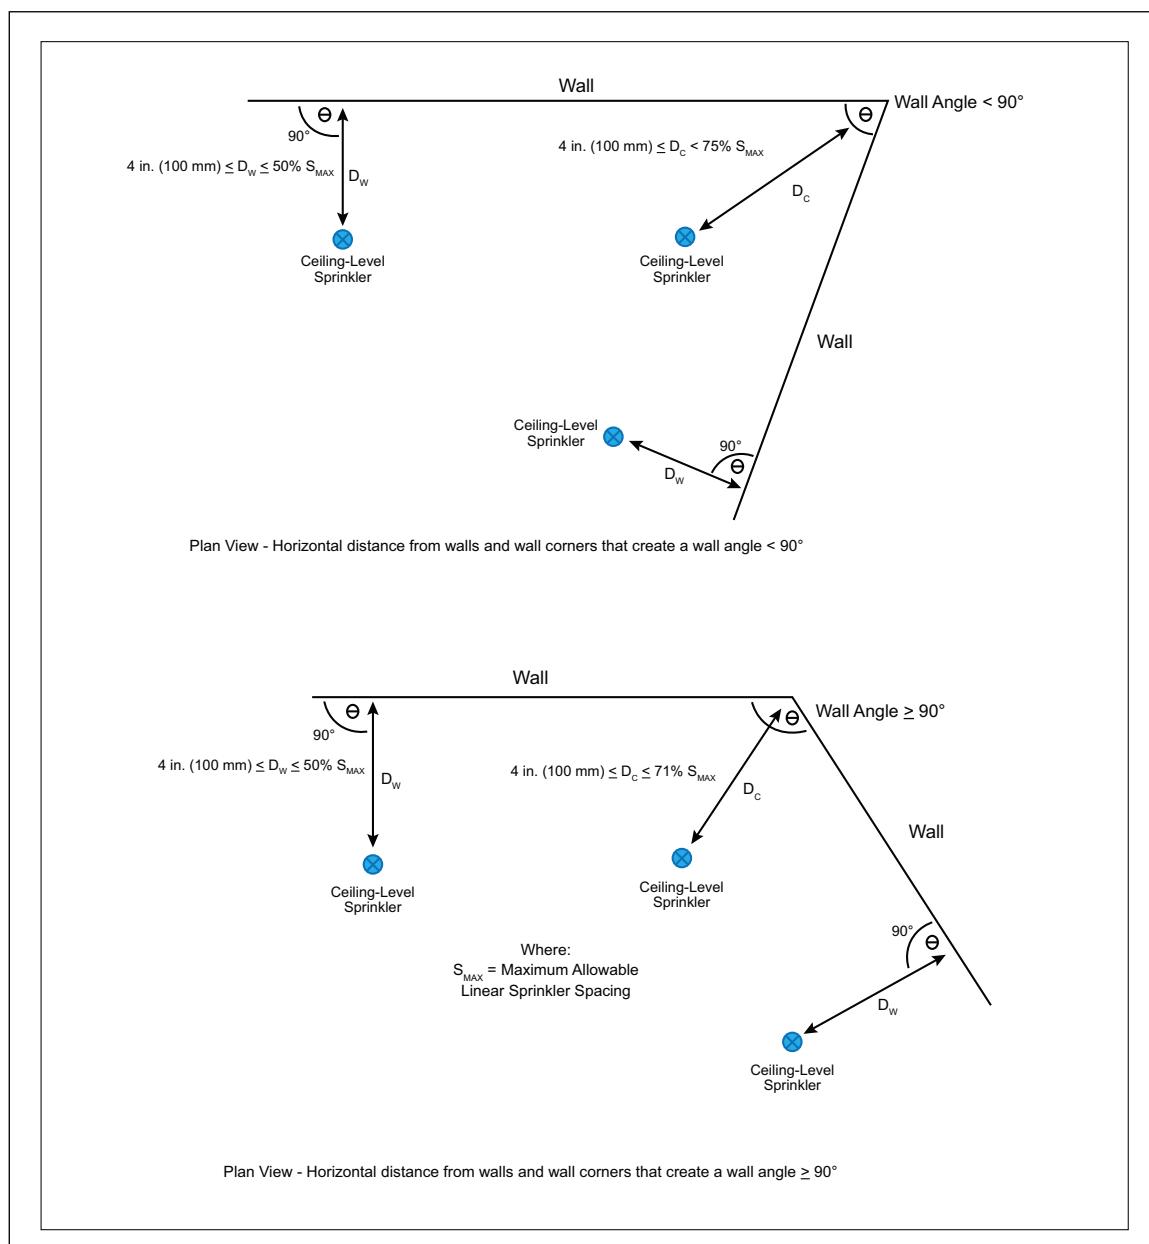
Horizontal distances from walls and wall corners to Storage sprinklers
